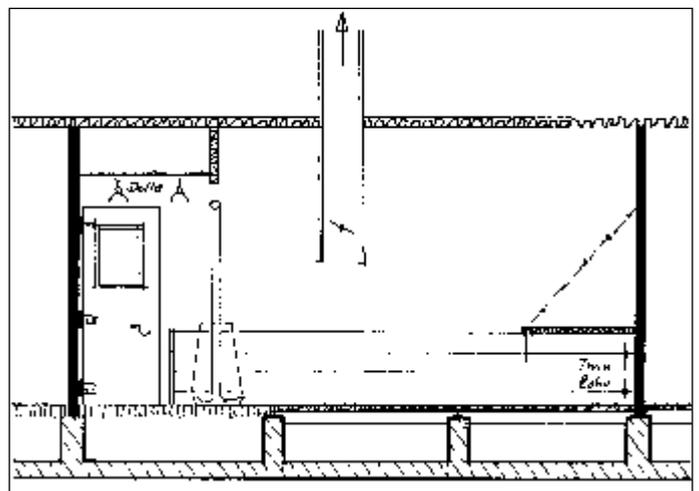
Profile through compartment with central perforated duct ventilation with room heating below the perforated duct (delta-pipes) and zone heating (delta-pipes) above wall-side lying zones
